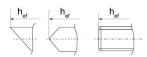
INSTALLATION PARAMETERS FOR THREADED ROADS AND REINFORCING BARS
